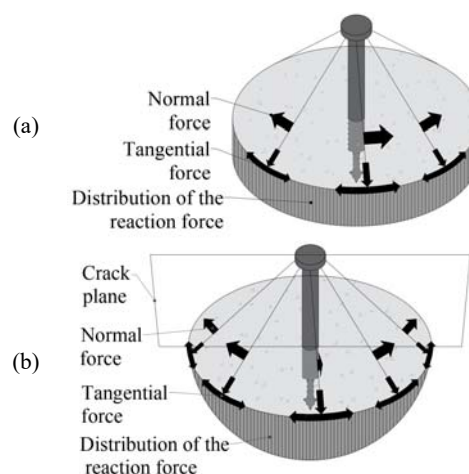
Influence of crack on the load transfer mechanisms. (a) uncracked concrete, (b) cracked concrete (adapted from [5])
